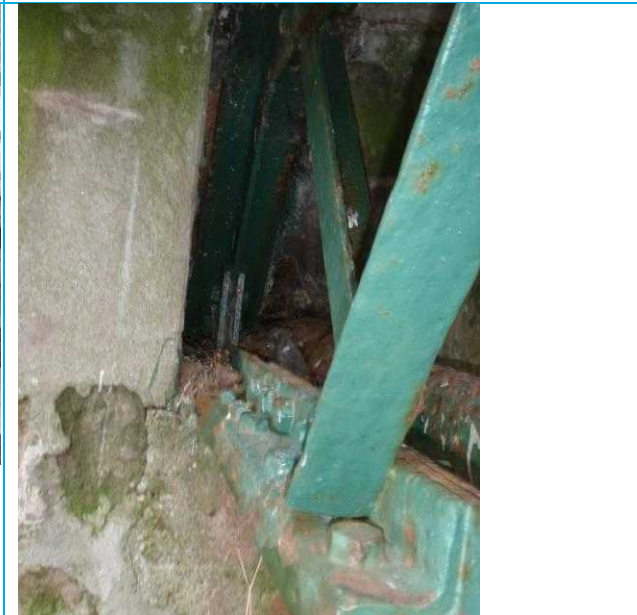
RHB abutment, note built in beam acting as moisture trap.
